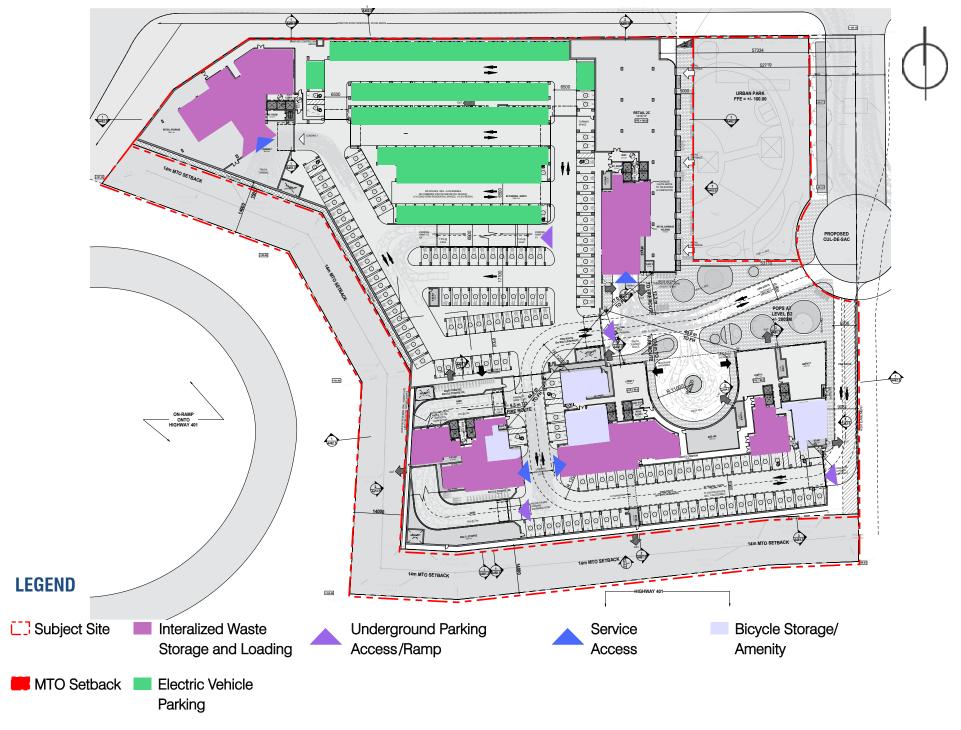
PARKING, LOADING AND SERVICING -LEVEL B2
